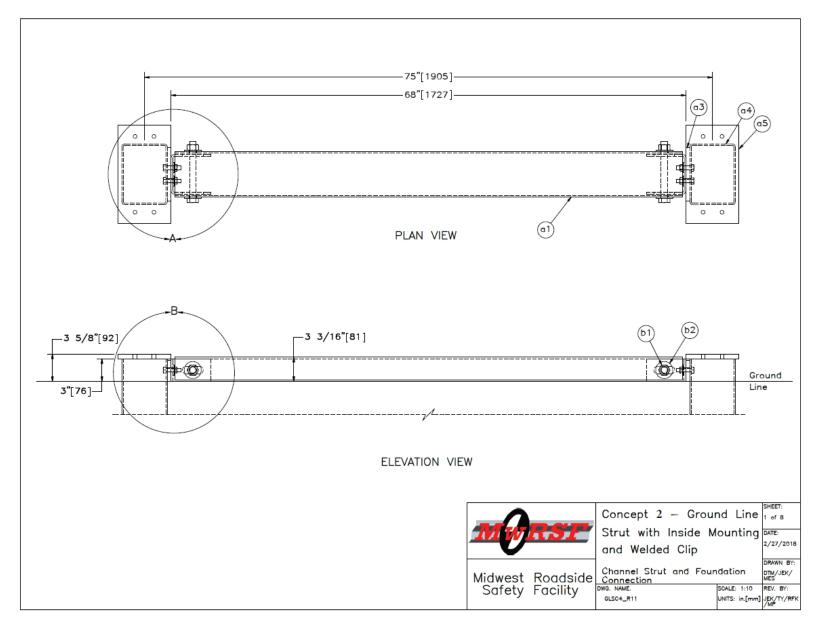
Ground Line Strut Design Concept No. 2 – Channel Strut and Foundation Connection
